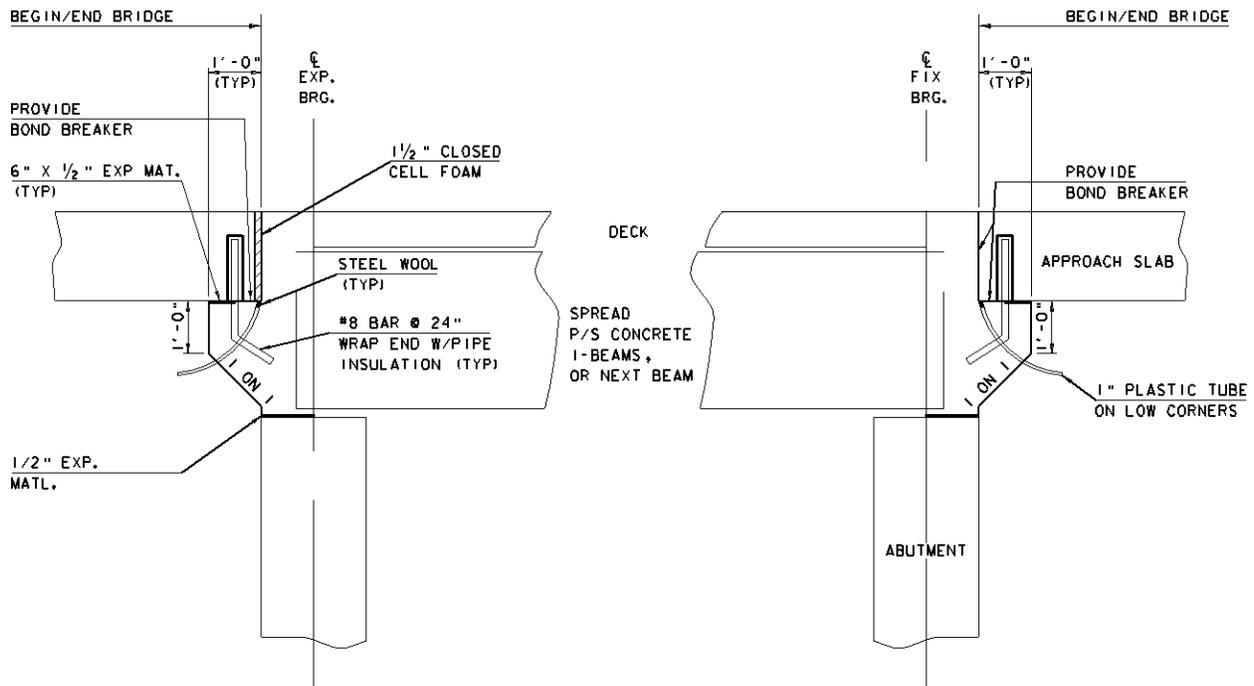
1 North East Bulb Tee (NEBT) Type F Bridge End Detail
